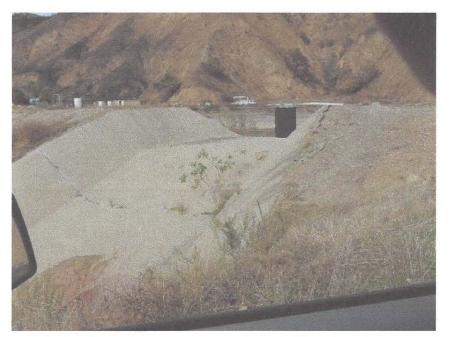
Vegetation and concrete crack in spillway of Basin D
